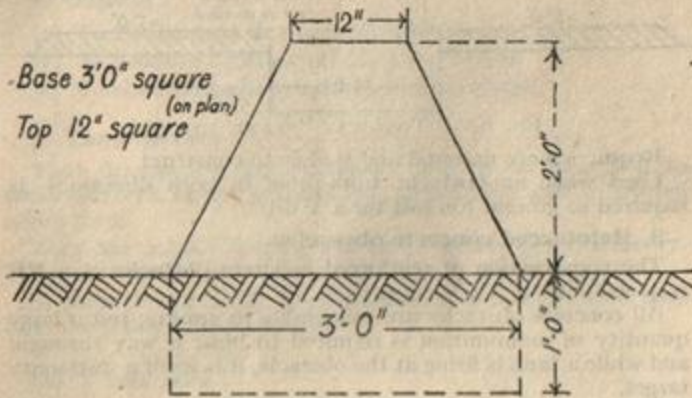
REINFORCED CONCRETE "PIMPLE"
